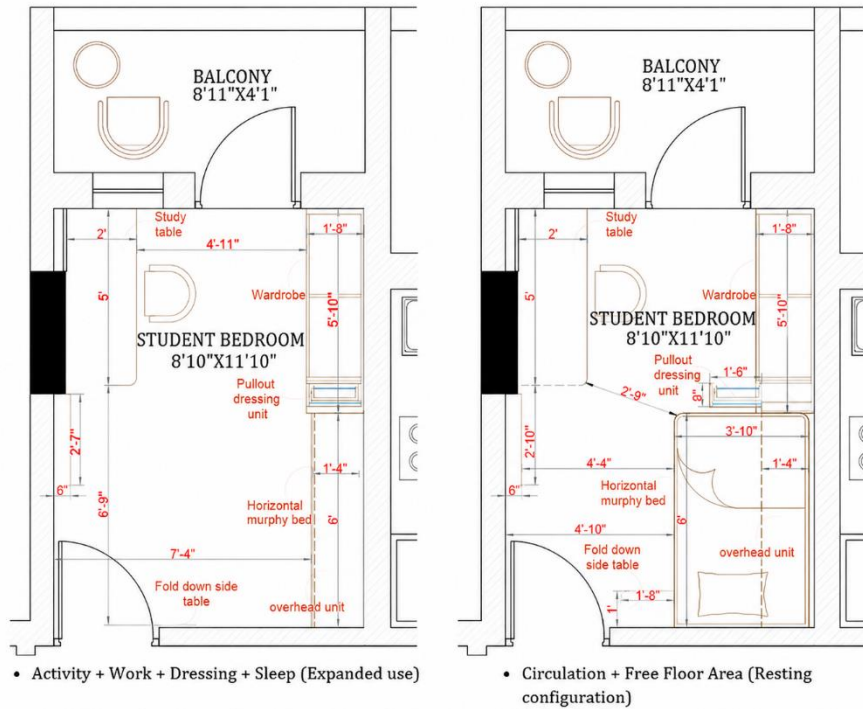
Dual configuration layout showing expanded work mode and free-floor resting mode.
